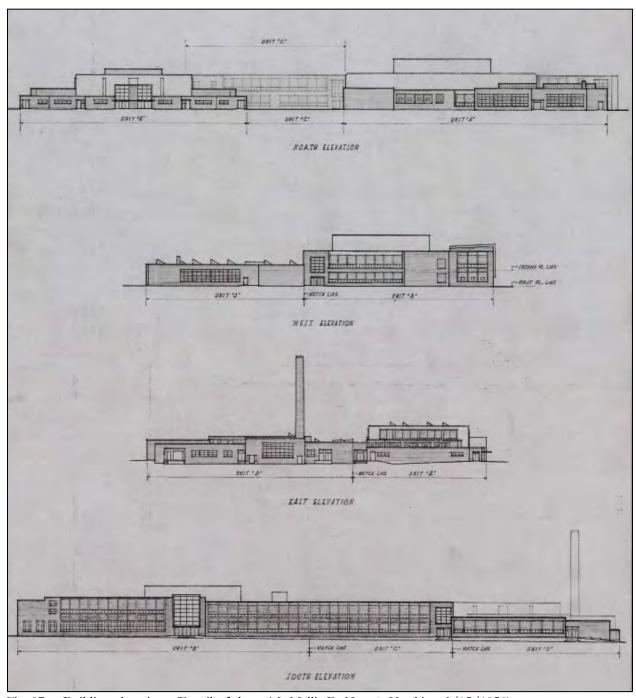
Building elevations (Detail of sheet A3, Mallis DeHart & Hopkins, 3/15/1950)
